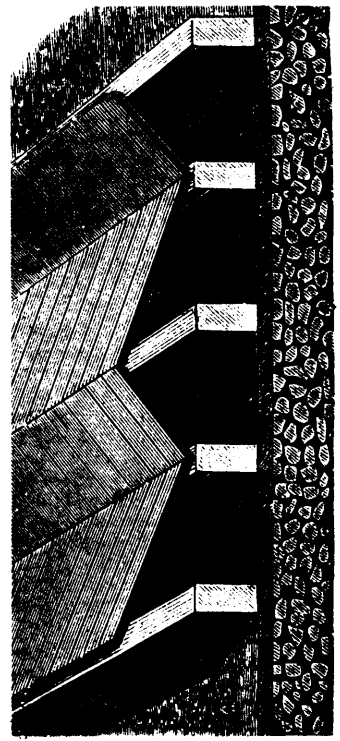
JOISTS AND FLOOR UPON A FOUNDATION OF BITUMEN AND CONCRETE.
